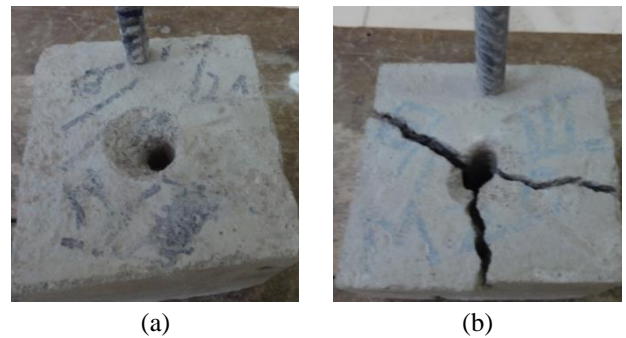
Typical type of failure of pull-out specimen: (a) pull-out failure; (b) splitting failure
